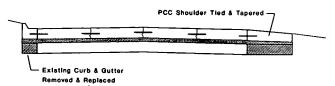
Curb and gutter and concrete shoulders should be tied to the mainline slabs; shoulders can be tapered (25).
